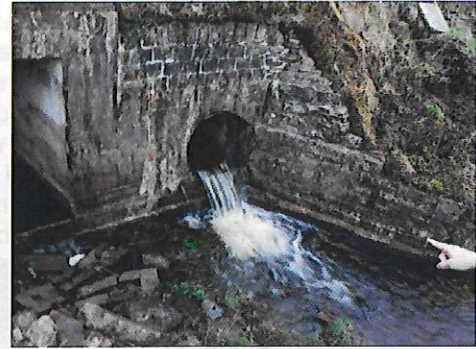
Downstream of Coolloughra Bridge, showing box culvert and concrete pipe.
